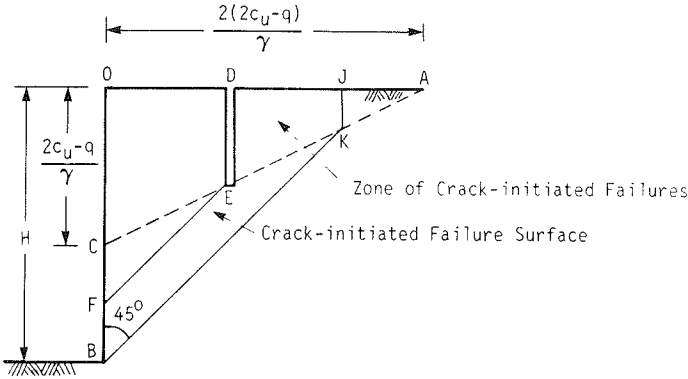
Crack-initiated failure surface in a geotextile Reinforced Earth wall with cohesive backfill. (Source: Ref. 18)
